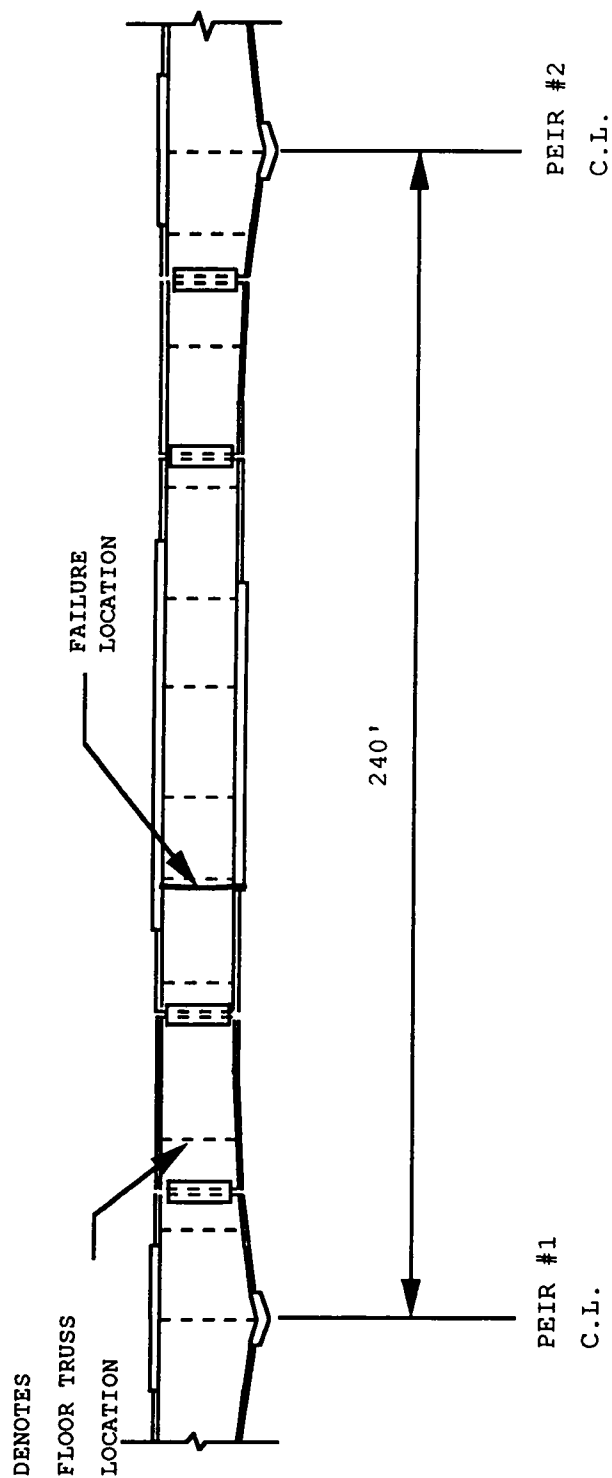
Elevation of Girder Number 4 in Span 2
